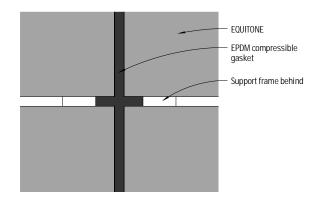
Open horizontal joint junction with vertical joint - Elevation
